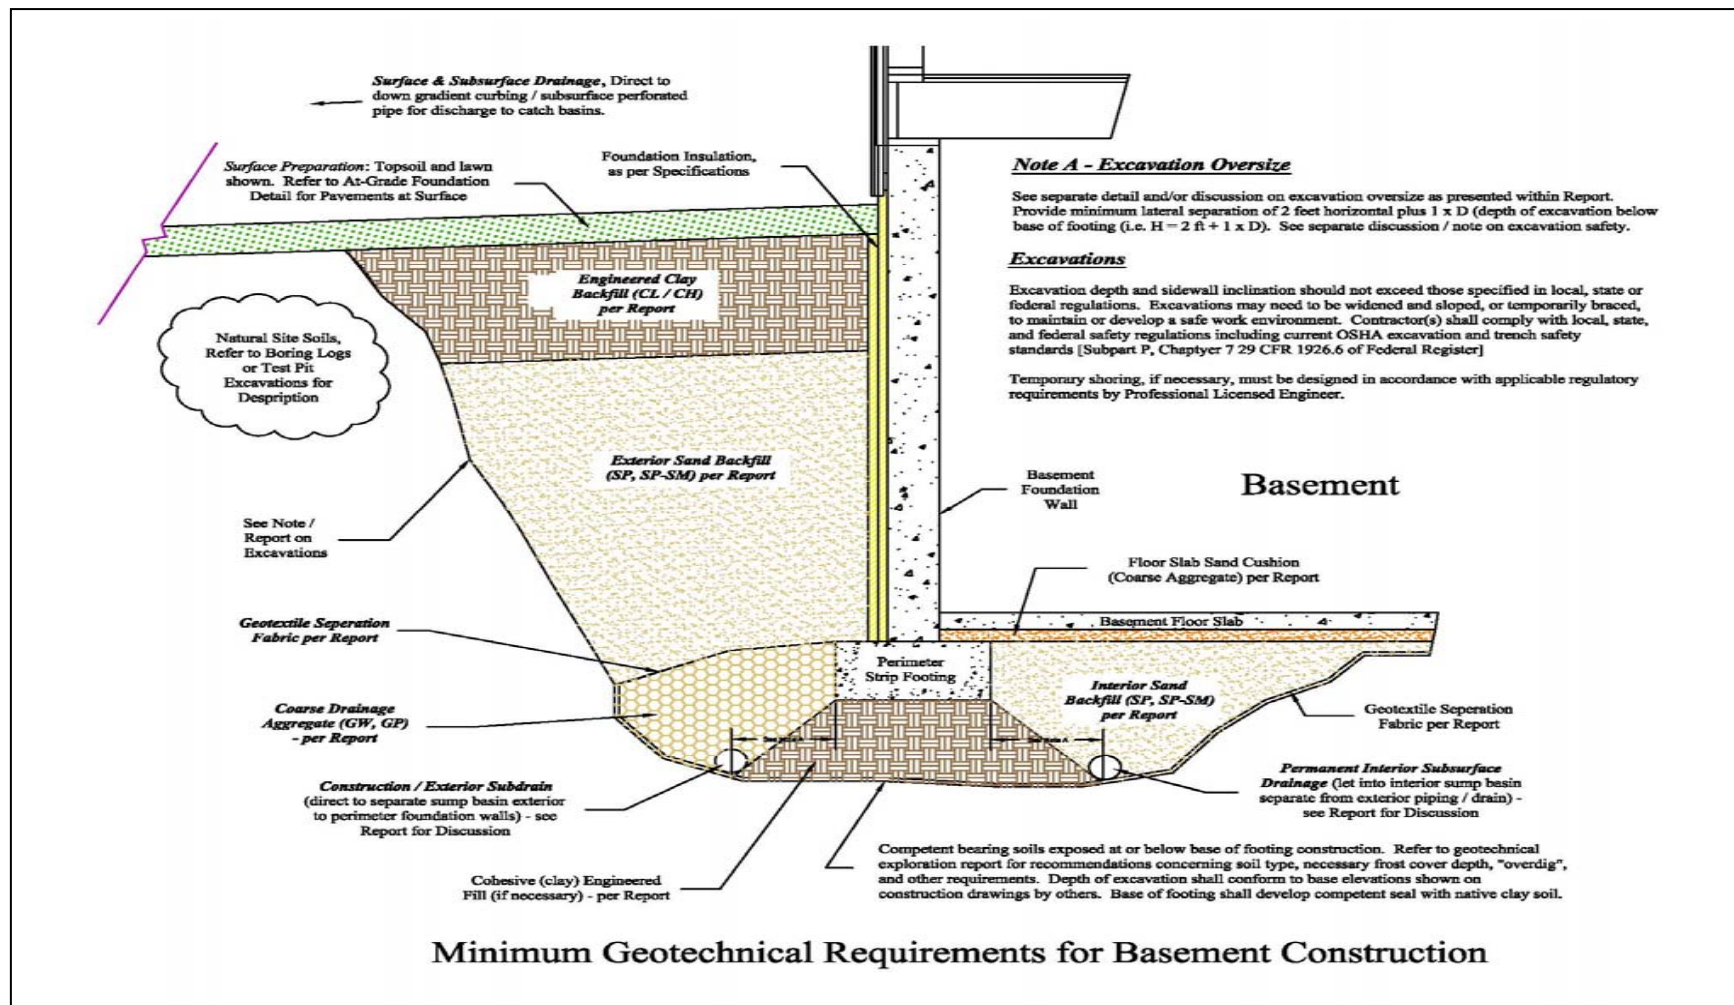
Minimum Geotechnical Requirements for Basement Construction
